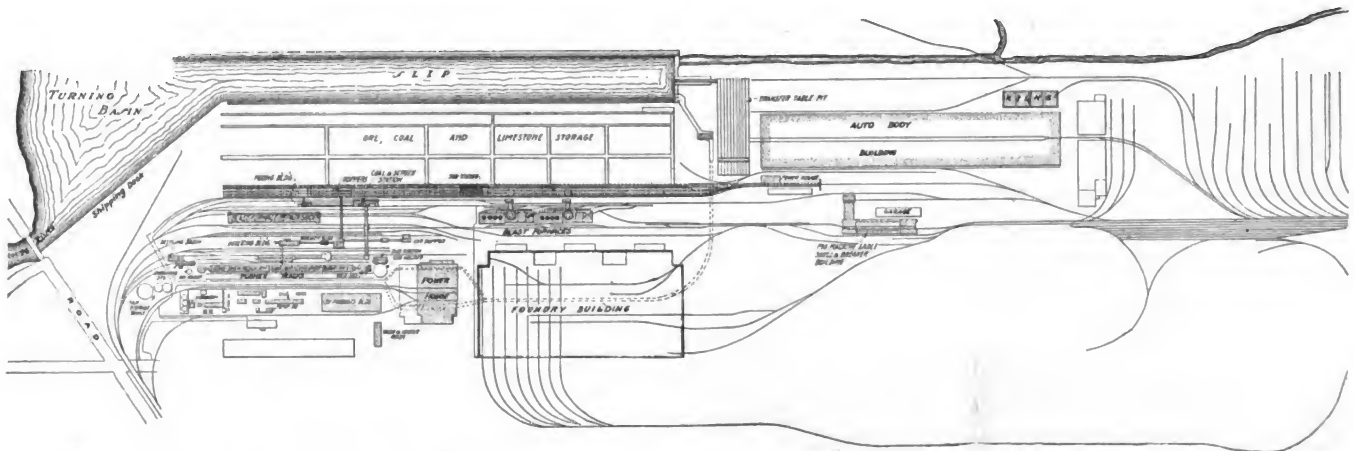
General plan of Ford's River Rouge plant showing disposition of various buildings and other units
